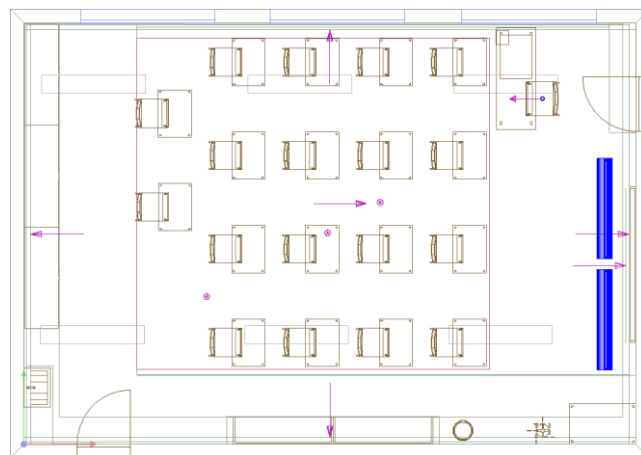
Floor plan of a room with objects and with calculate surfaces
